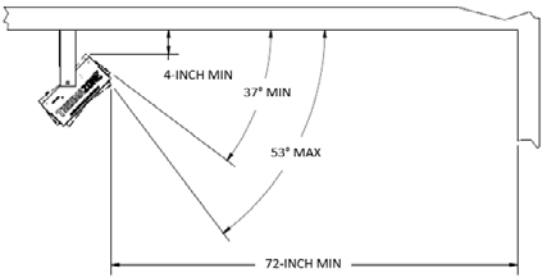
CEILING MOUNTING ANGLED TOWARDS VERTICAL SURFACE
